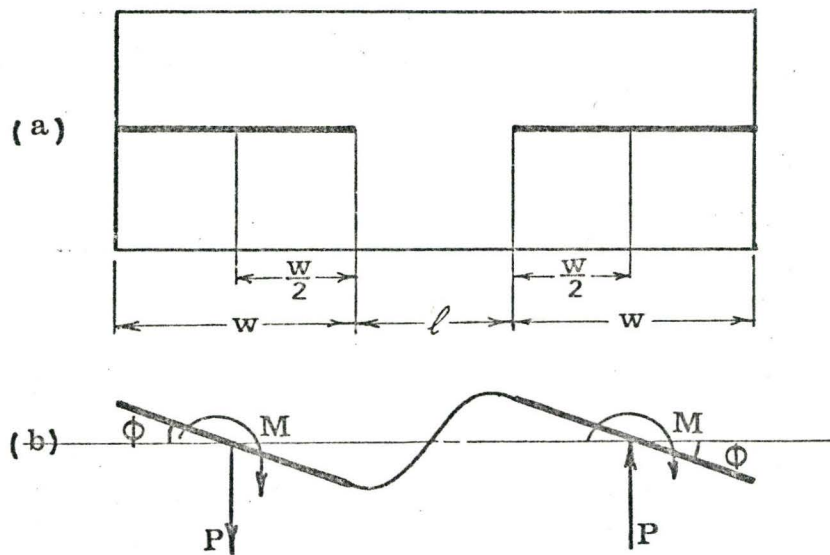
Typical Plan and the Rotation of Planar Walls.
